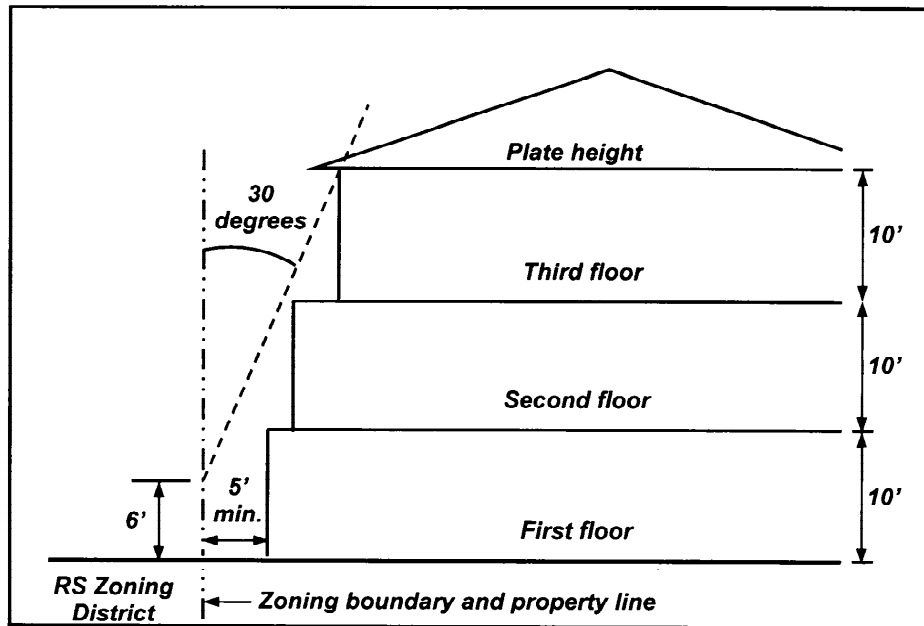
Side Yard Encroachment Plane under City of Gardens
